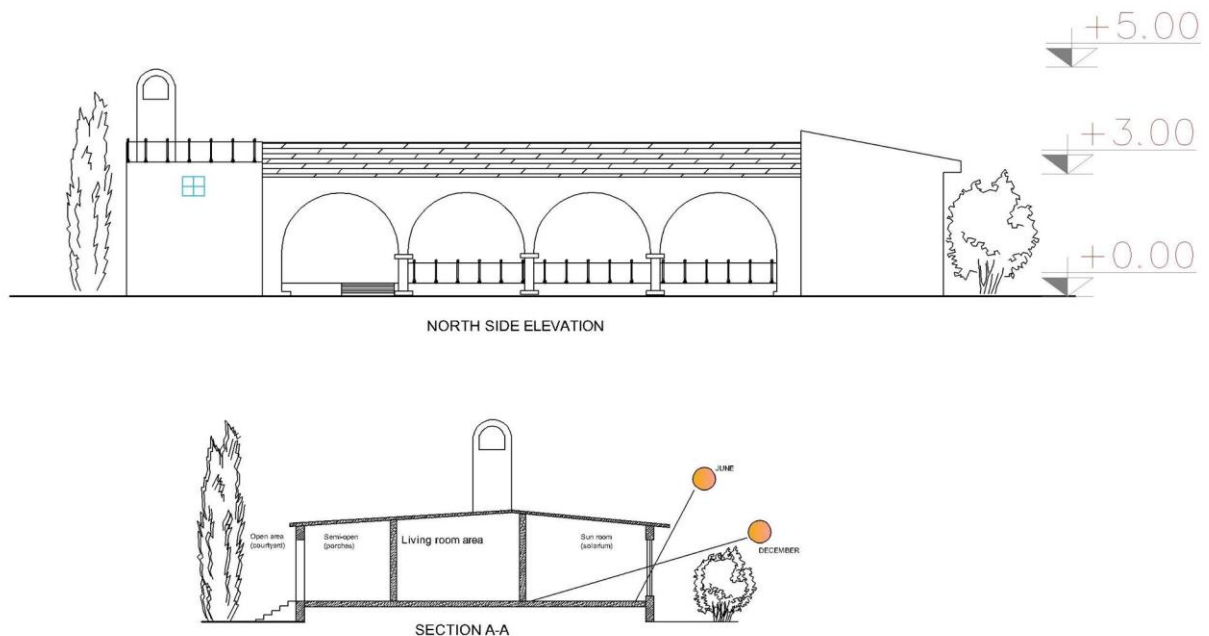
16 North side elevation and Section A.A (Position of Solarium Room)
